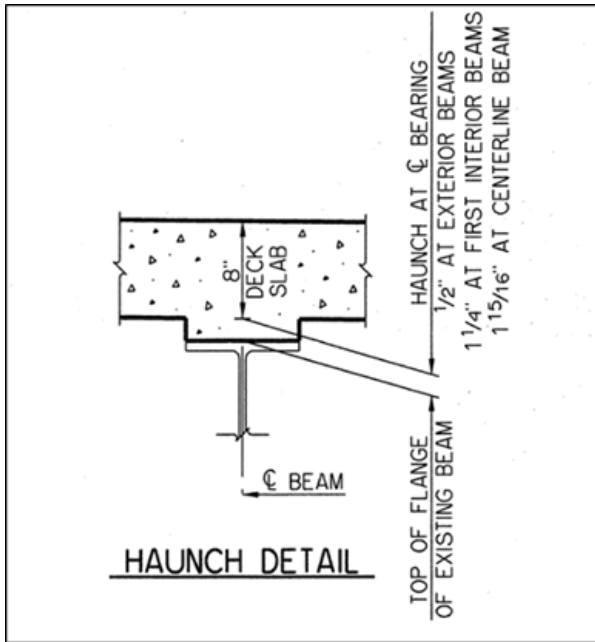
Haunch Detail from ODOT standard Drawings – SH 14 bridge
